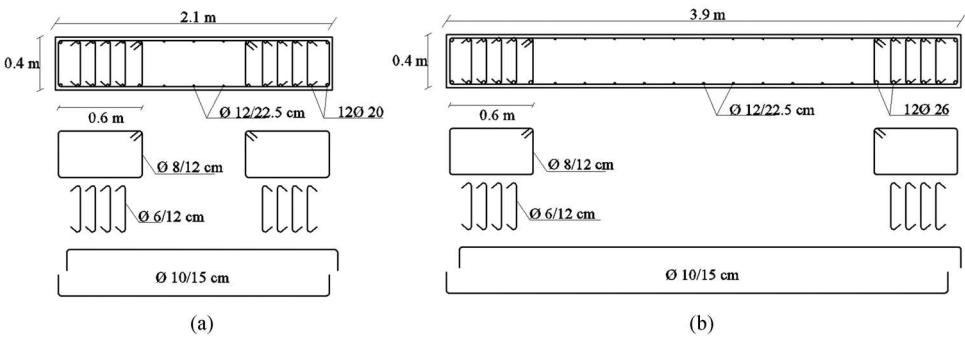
Arrangement of wall reinforcement: (a) Wall piers of HCW system (b) RC wall
